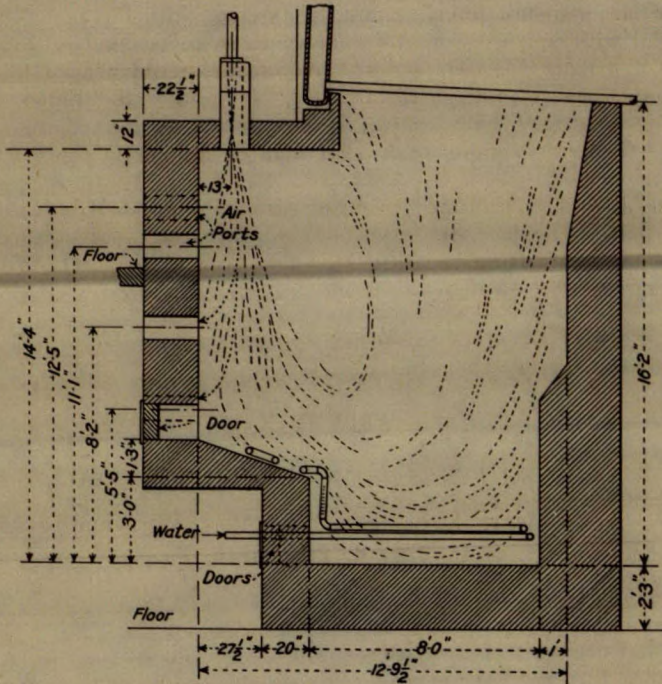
Section through furnace, showing arrangement of burner and cooling coil over hearth and near bottom of furnace.
